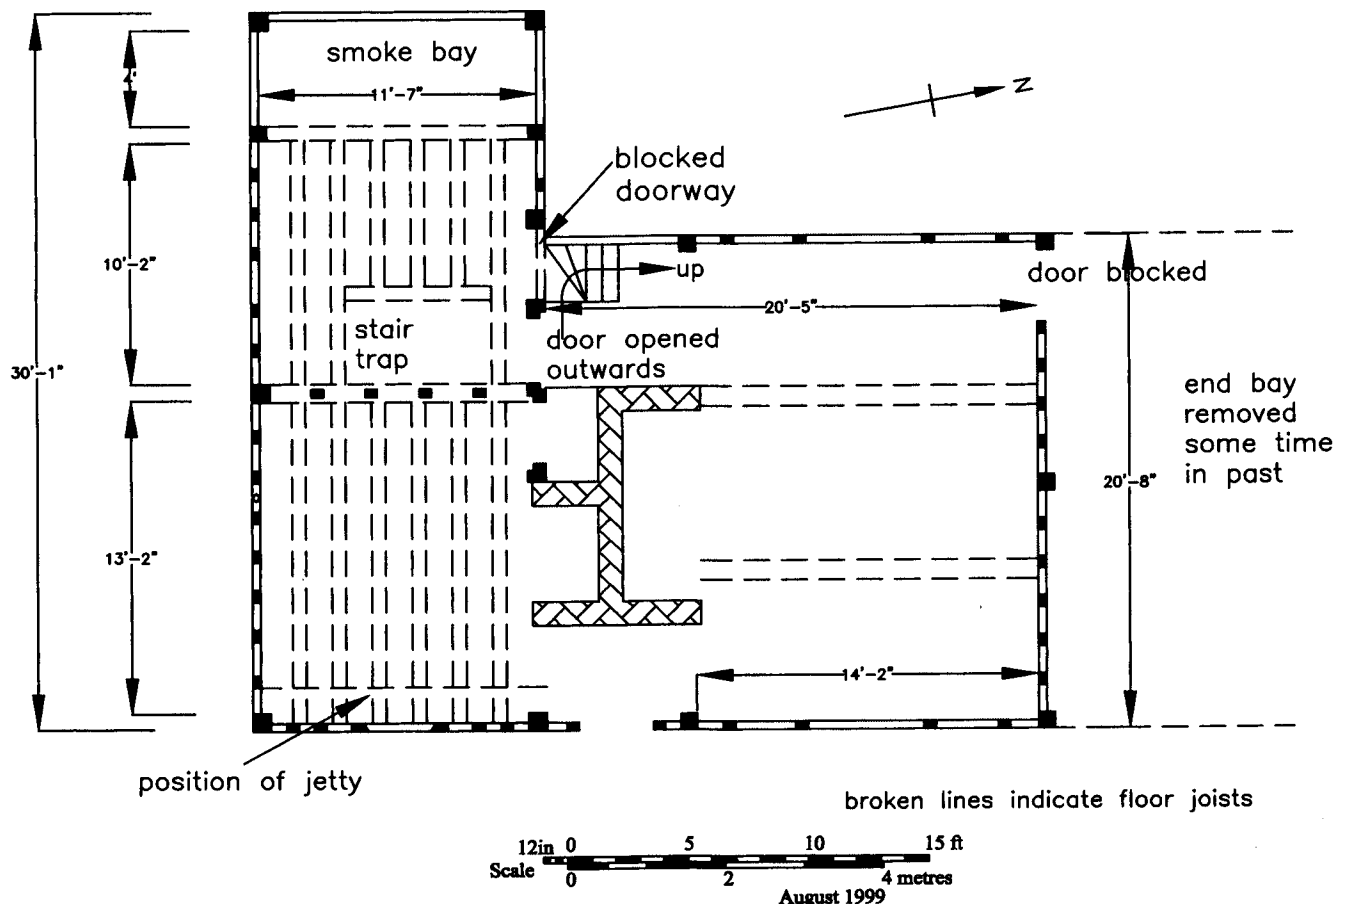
Tilehouse Farm, Willingale, ground plan.
